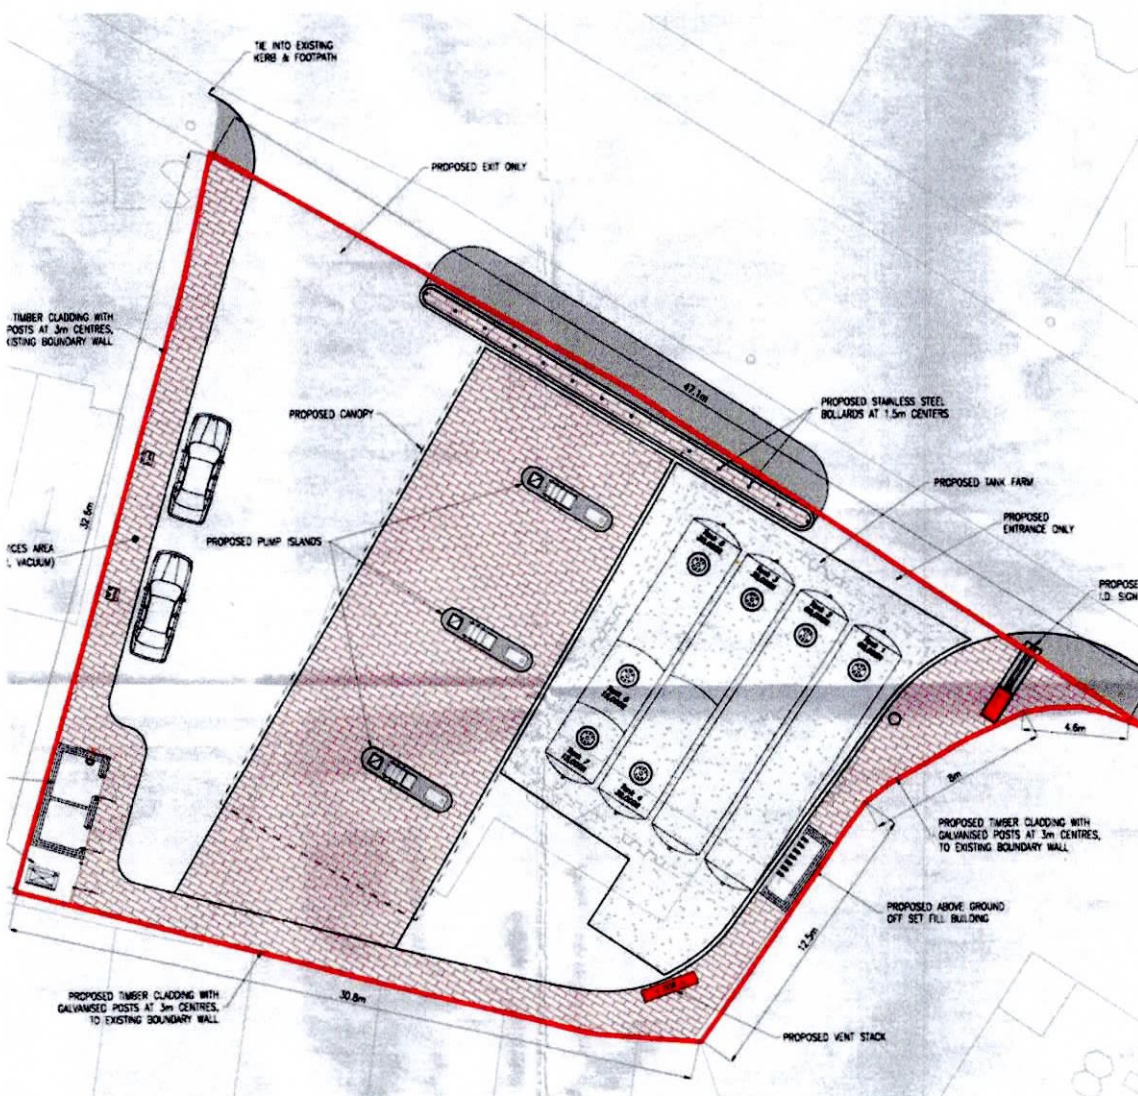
Site layout plan approved under Reg. Ref. 4353/17.
